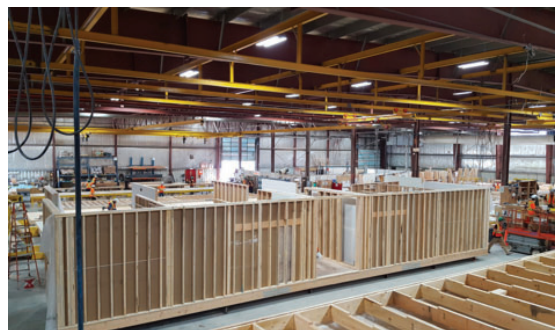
Prefabricated plant for wooden structures: Metric Modular. Source: www.naturallywood.com
